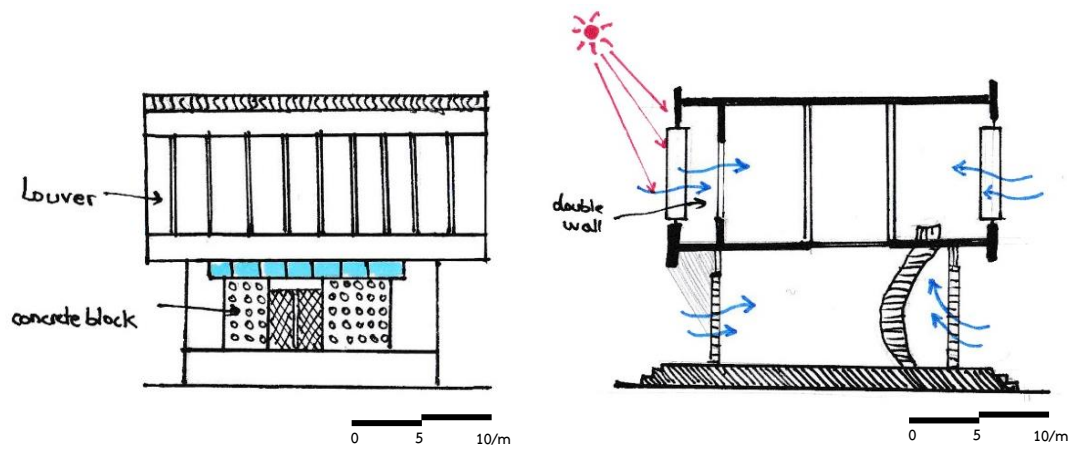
62 Diagram drawing showing the section, air circulation and double wall that allow indirect lighting into the building
